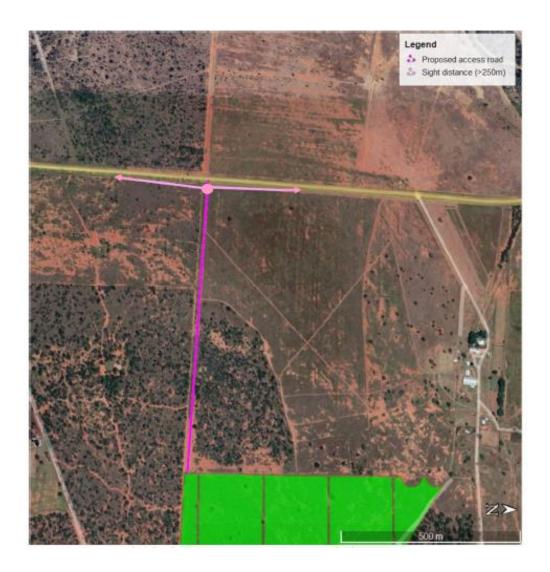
Required sight distances at the access road to Onderstepoort Solar 2 (Wink, 2023)
